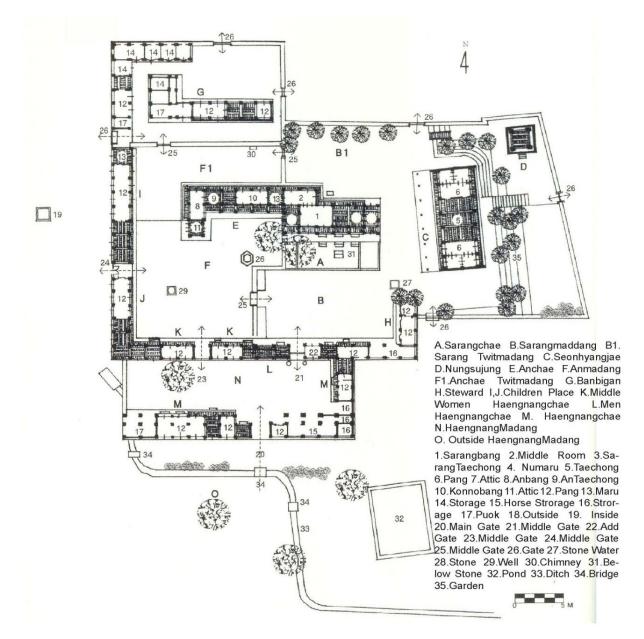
Site Layout (Original Plan) (N. Zu 2003)
